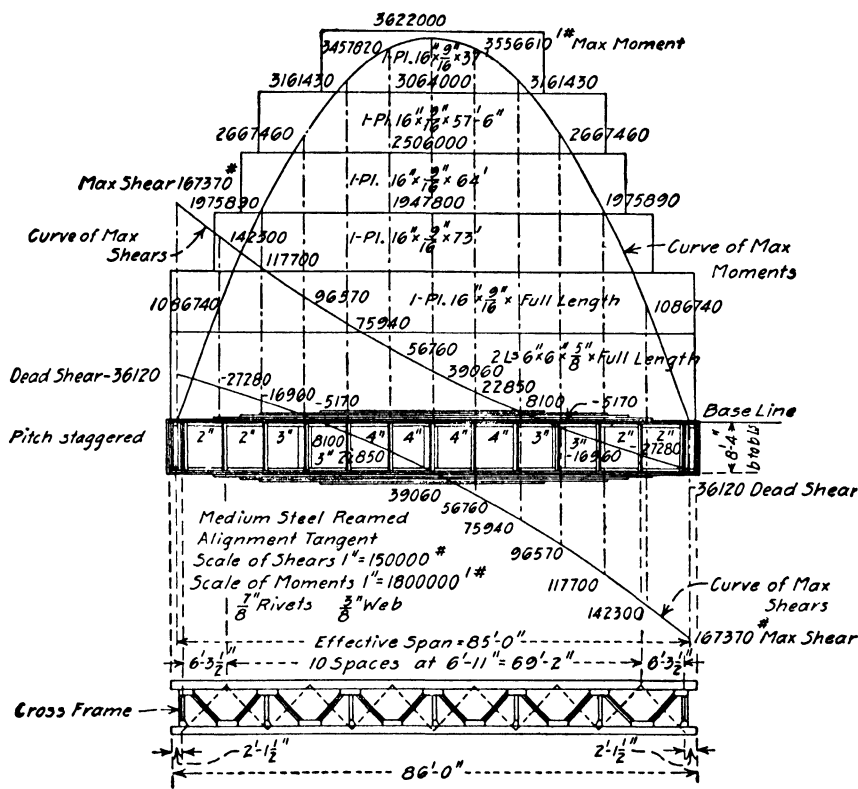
SHEARS AND MOMENTS IN A RAILWAY PLATE GIRDER.
